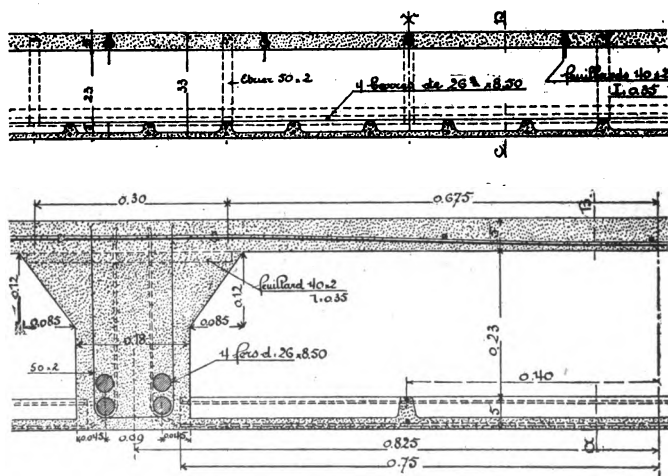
Section Through Girder and Floor Construction with Reinforced Concrete Ceiling.
